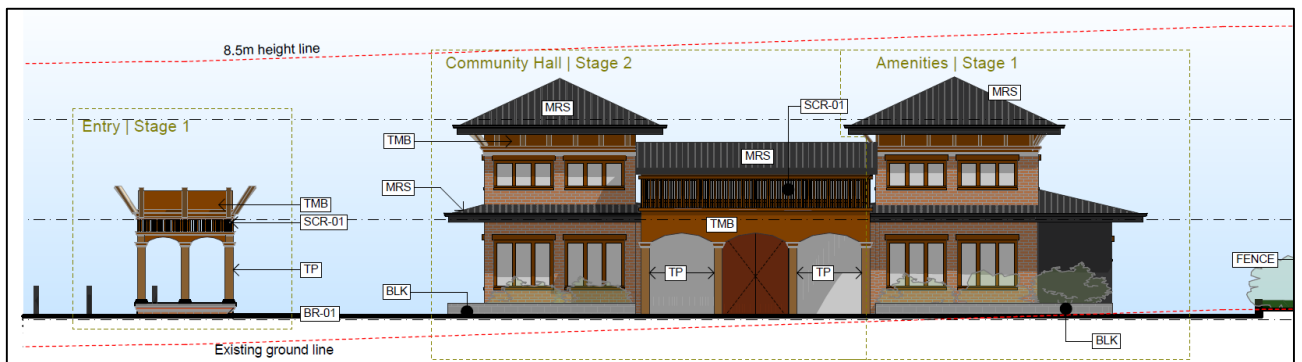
Proposed Plan of Development – Community Hall and Stupa Elevation
